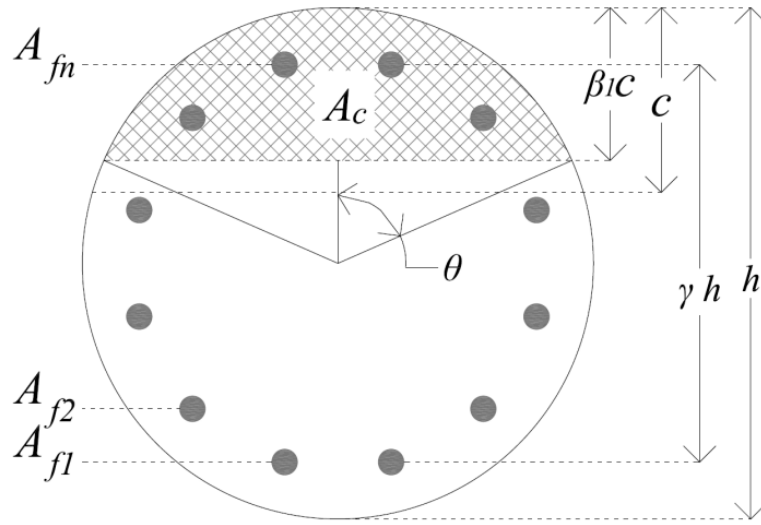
Circular concrete column reinforced with n layers of FRP bars
